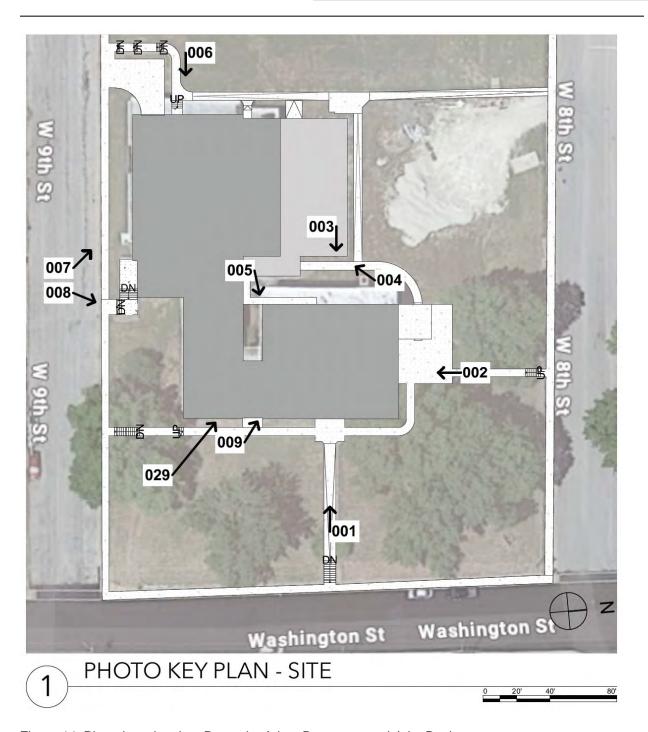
Photo key site plan. Drawn by Adam Davenport and Jake Decker.
